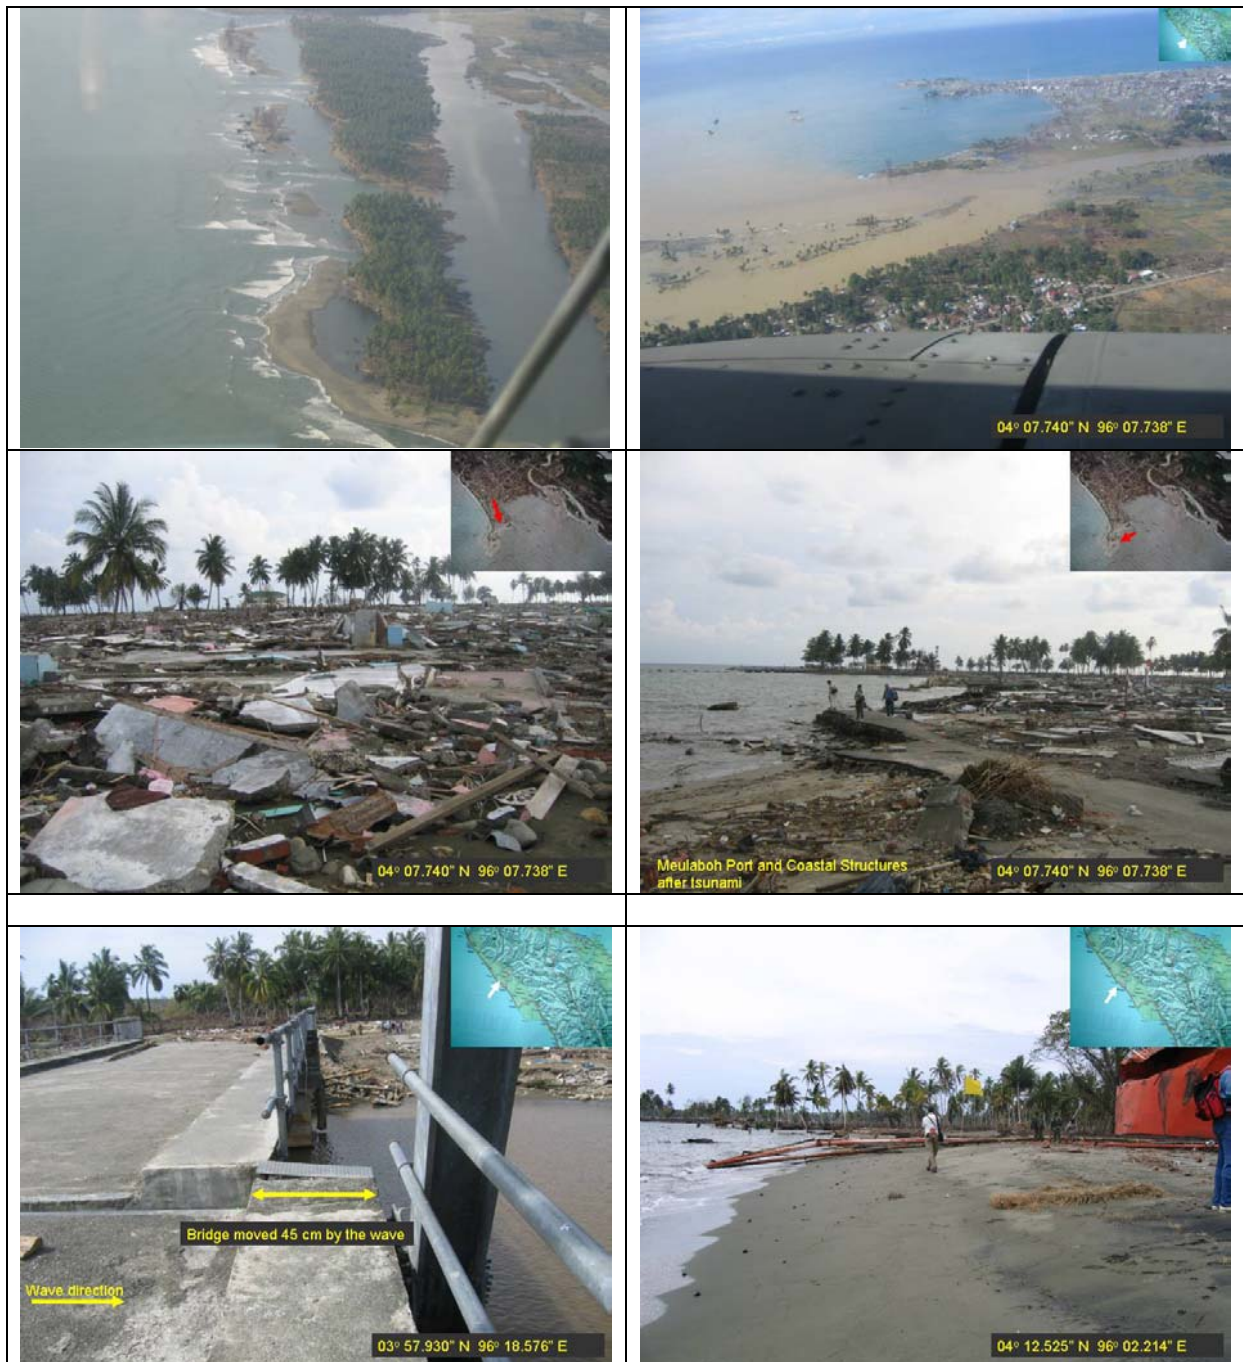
The Typical Damages and Damage Levels of Tsunami on Infrastructures
